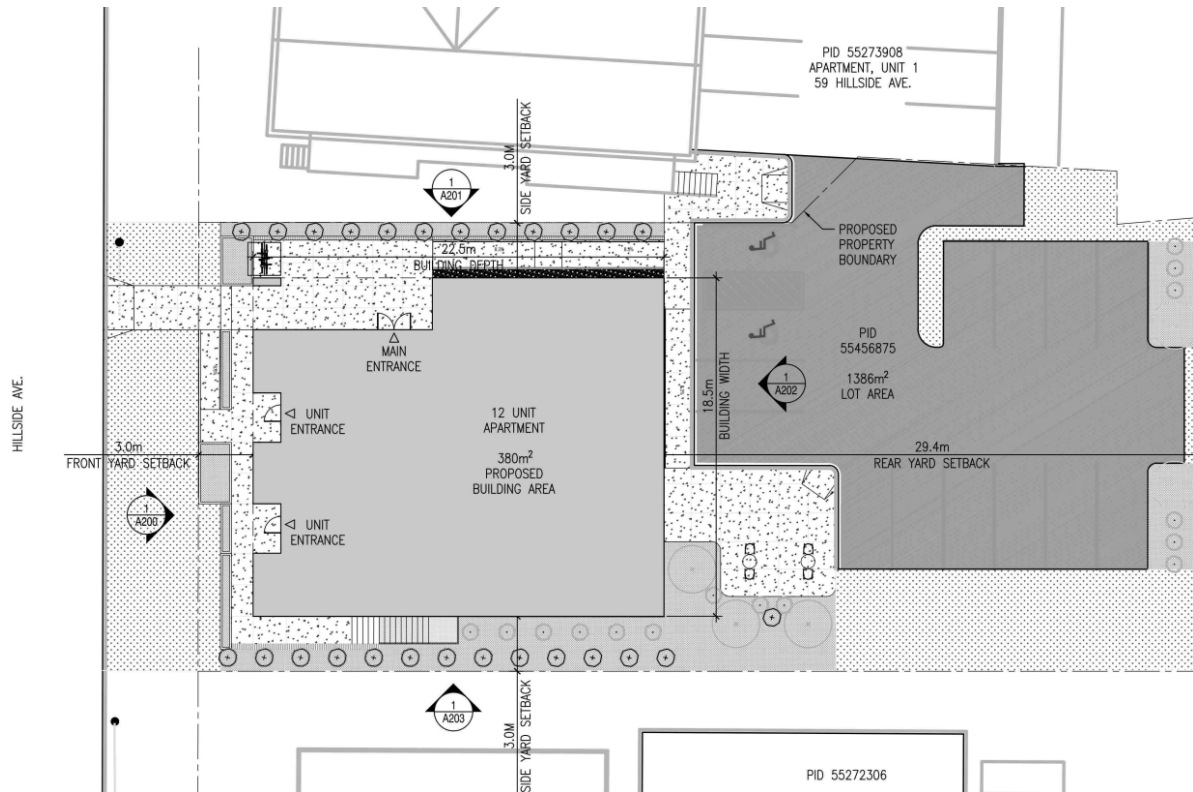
Proposed Site Plan (shared driveway with adjacent property to the north)
